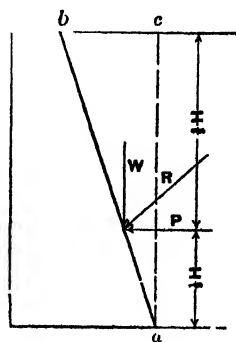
Earth Pressure on Inclined Back of a Wall (See p. 665)
